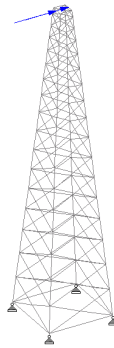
Hub level Shear Force acting at 30 m Lattice Tower
